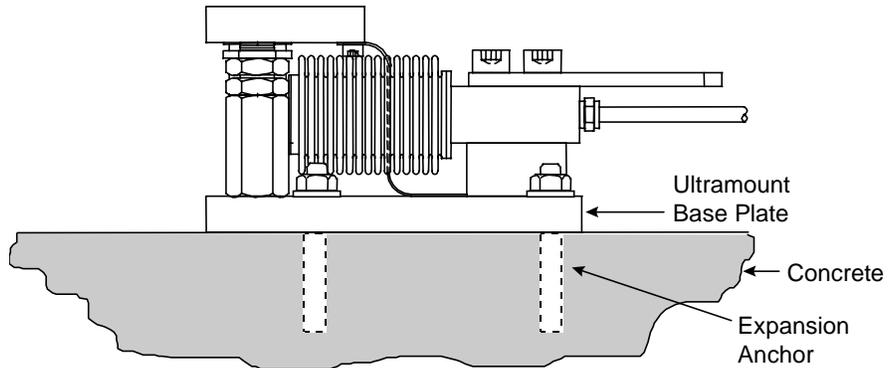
Base Plate Bolted to Level Concrete Floor
